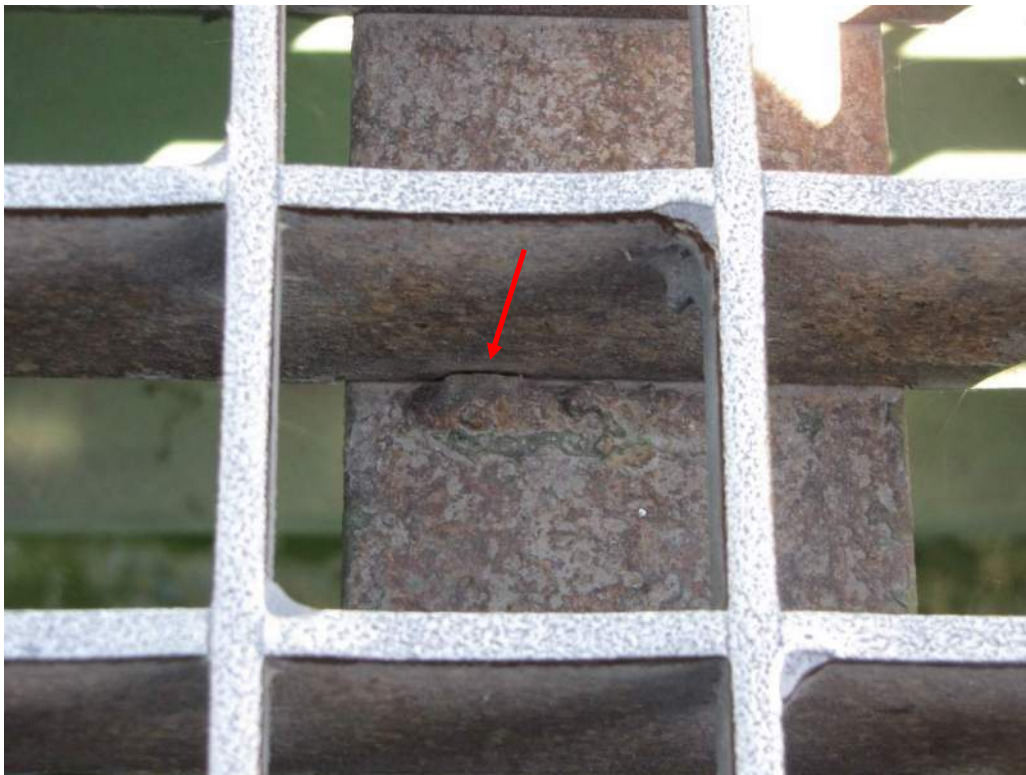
Cracked bar-to-sill weld in deck grating panel 2-4 C. The serrated edges have been completely worn away within the wheel tracks.
